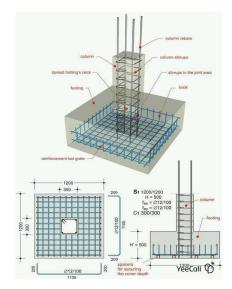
SHOWS THE ELEMENTS OF THE BEAM AND COLUMN STRUCTURE SYSTEM.
